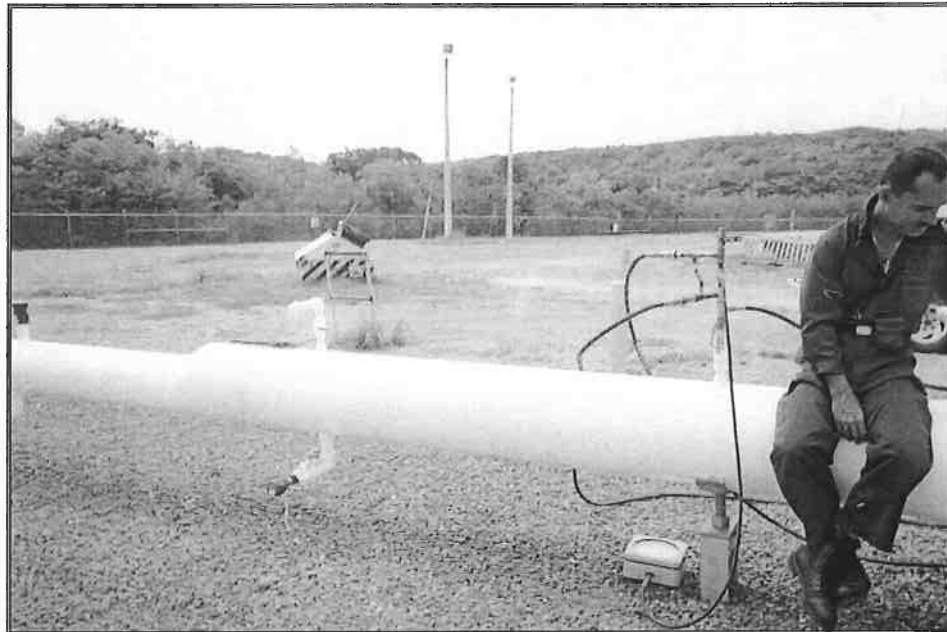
Test No. 8 DFM-Primary Test Location at VP 27
